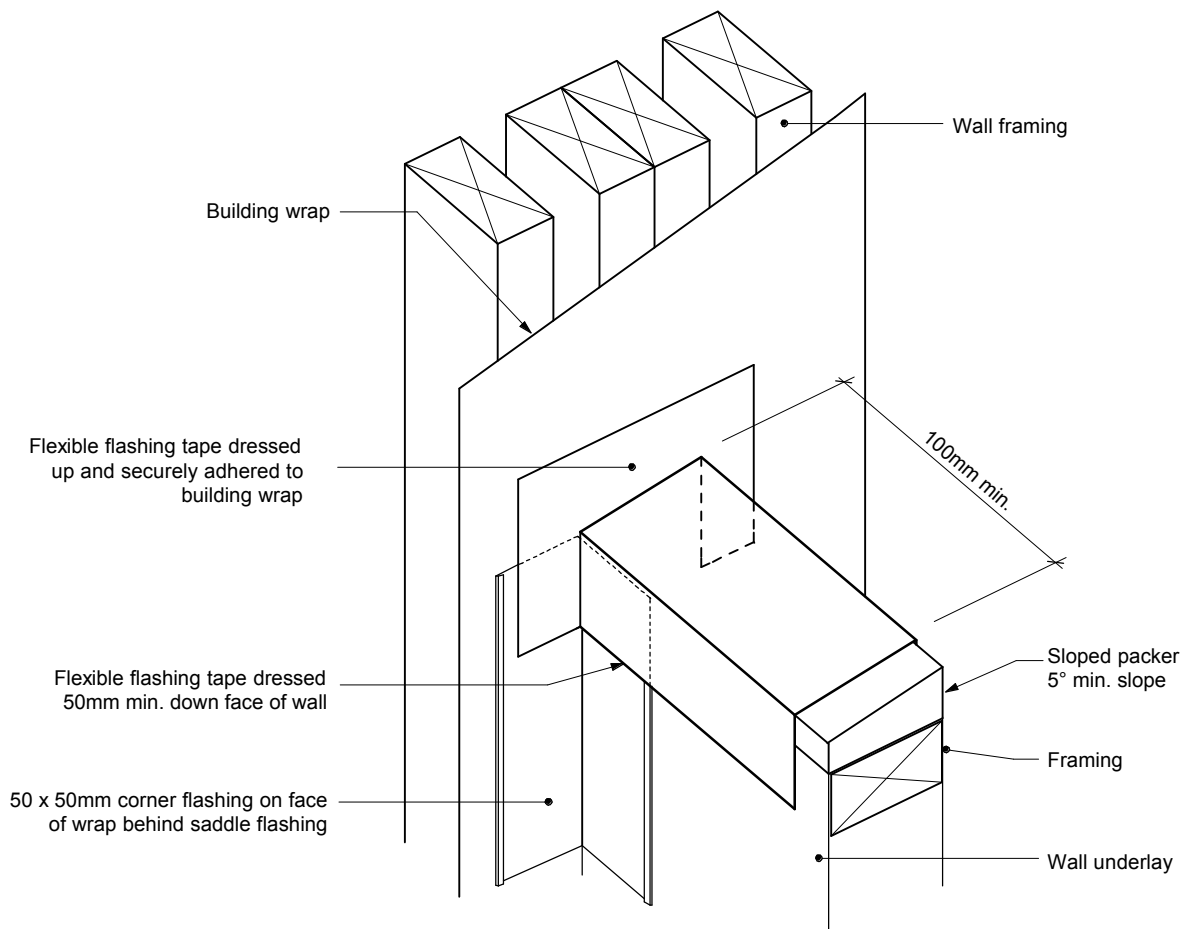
(a) Direct fixed - Balustrade - Wall junction - Step 1
